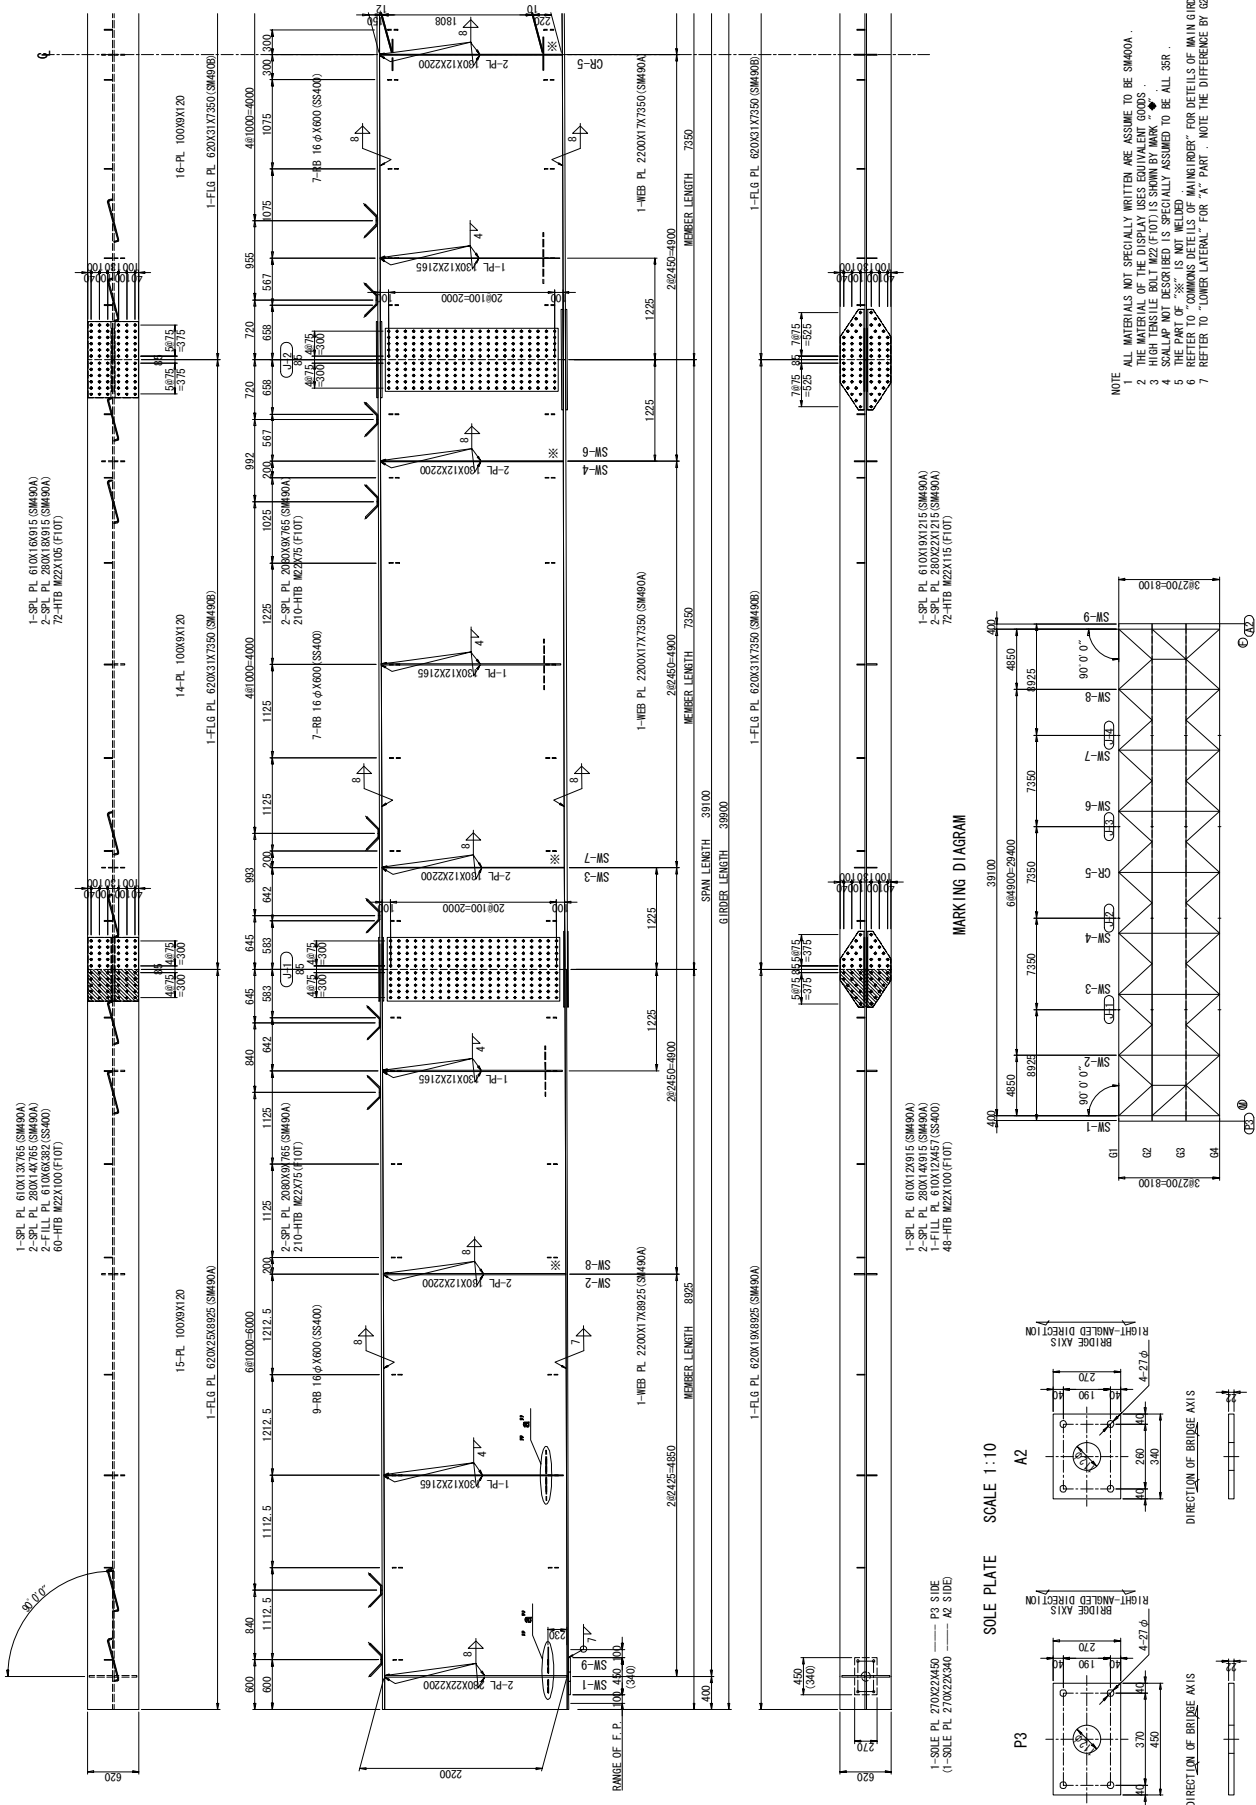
DETAILS OF STEEL MAIN GIRDER G1, G4 SCALE 1:30
